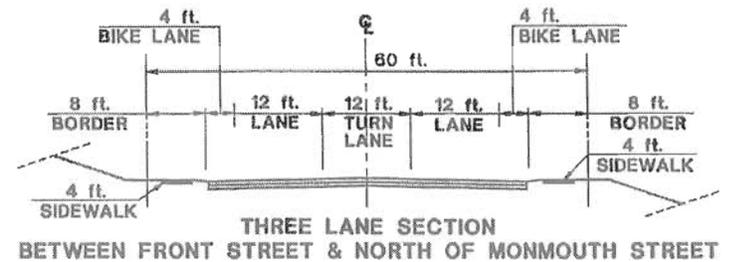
Route 35 Front Street to North of Monmouth Street, Typical Section
